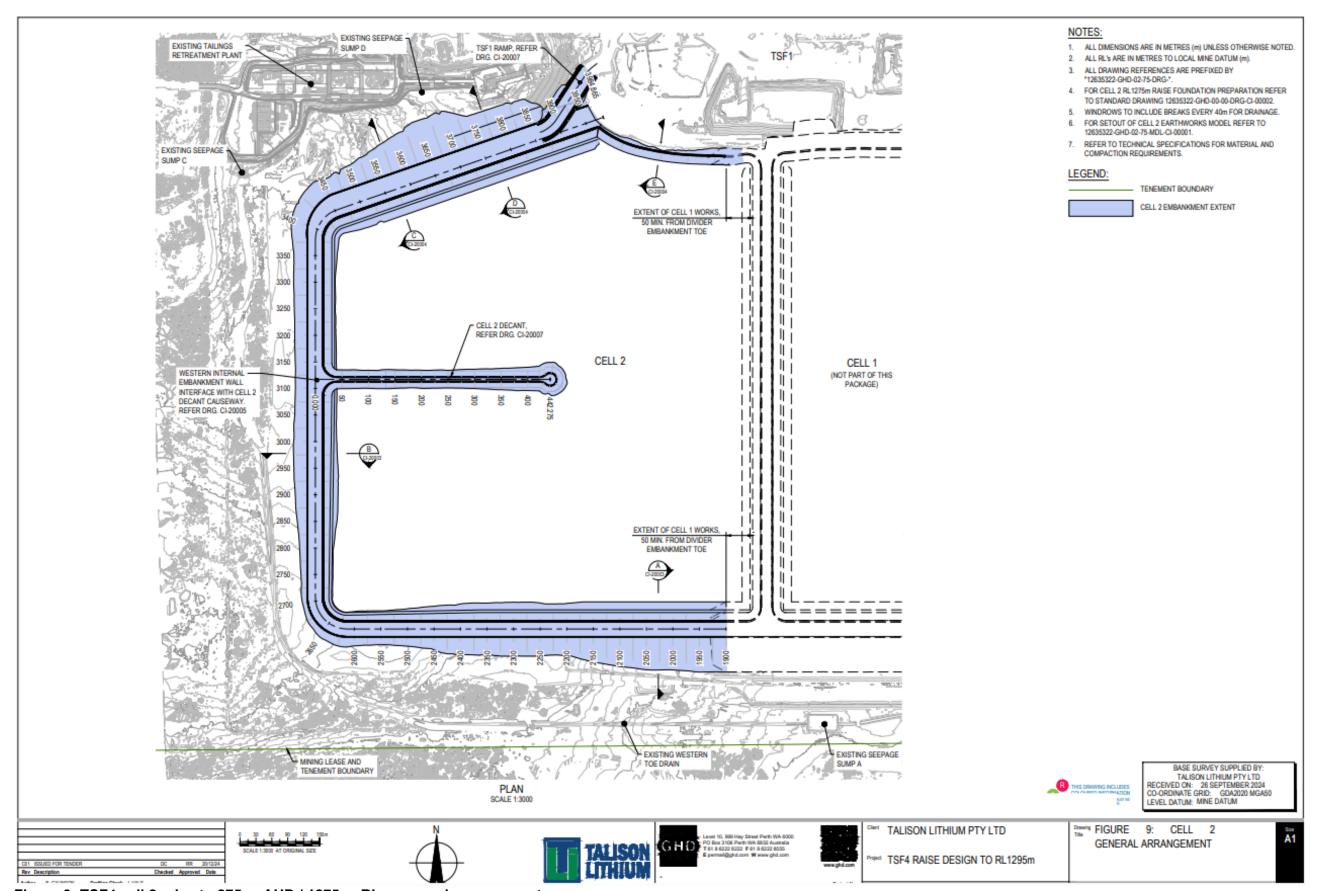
TSF4 cell 2 raise to 275 m AHD / 1275 m RL – general arrangement
